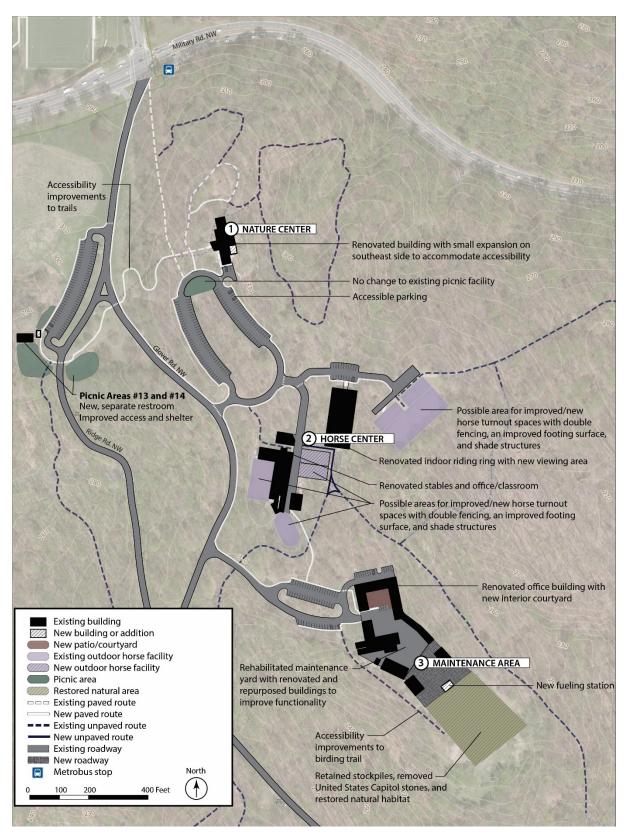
ROCK CREEK PARK—NATURE CENTER COMPLEX DEVELOPMENT CONCEPT PLAN— Alternative 2: Fix It
